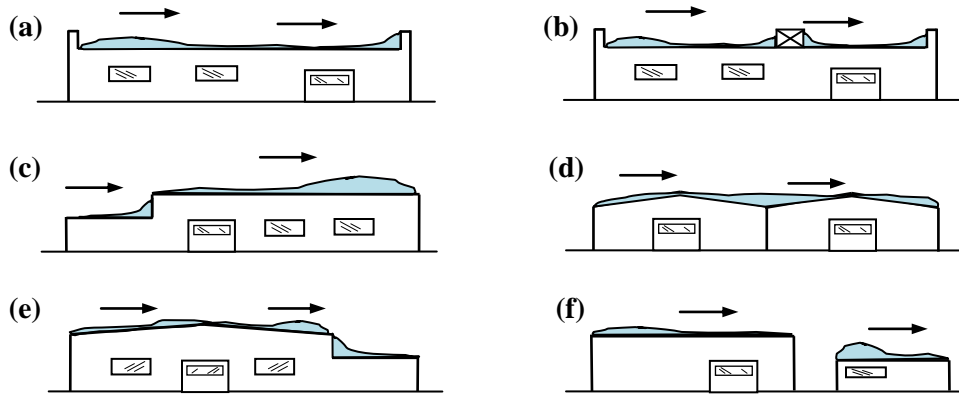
Elevation views depicting the effects of snow drifting around roof obstructions on lightweight metal buildings with (a) parapets (b) mechanical equipment and parapets (c) multi-step roofs (d) low-sloped gable roofs (e) low-sloped gable, multi-stepped roofs (f) neighboring buildings.
